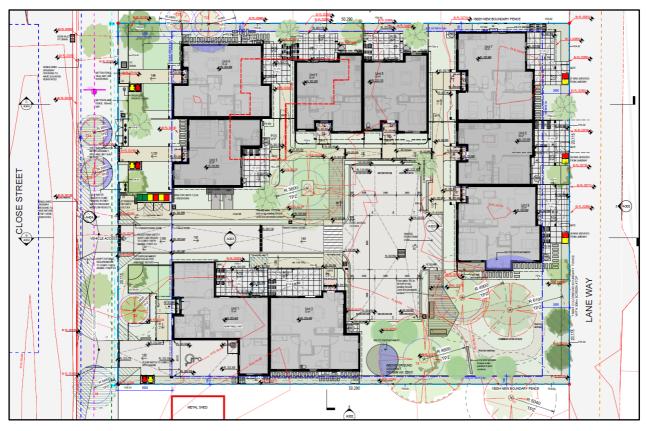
Extract from Architectural Plans – Site Plan (Source: Site Plans, SARM Architects, dated 29/11/2023)
